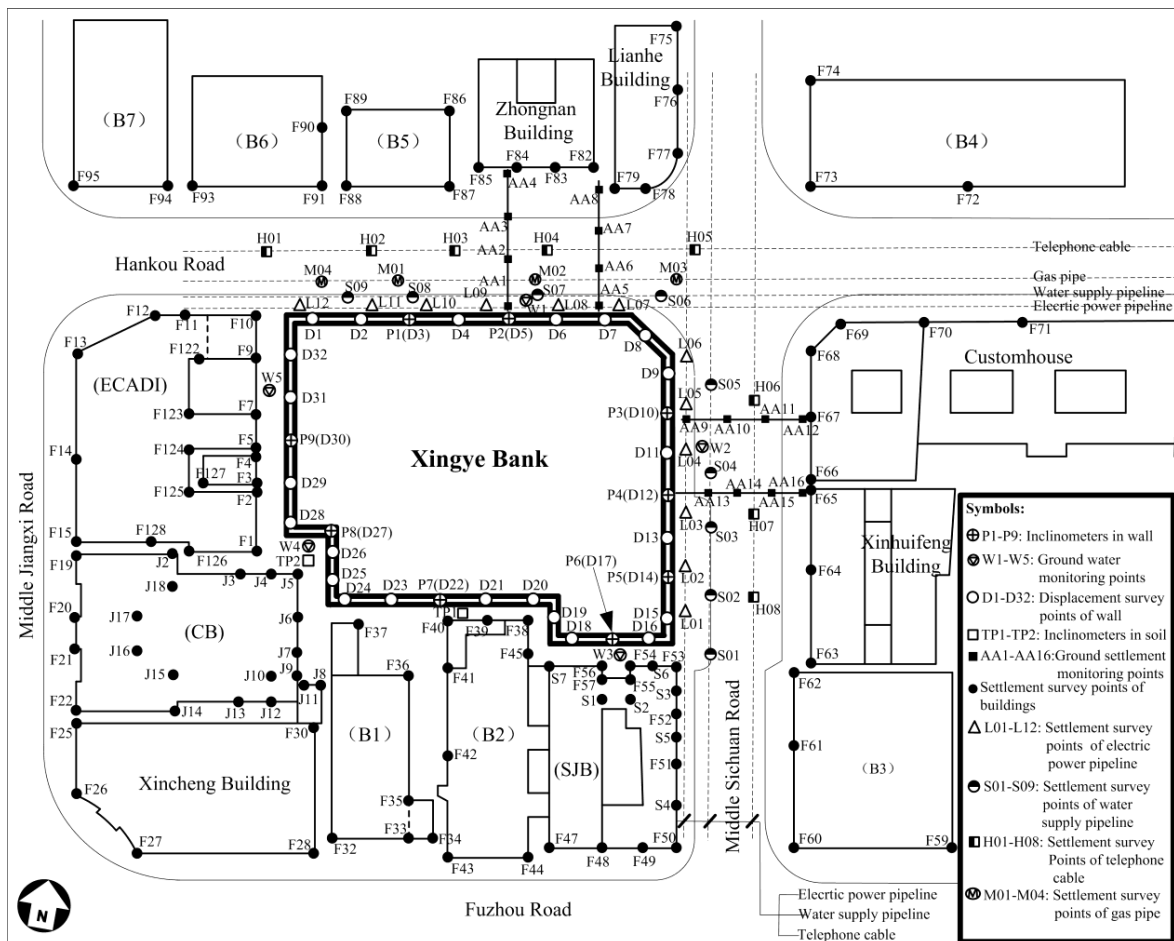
Layout of instrumentation at the construction site (Xu 2007)
